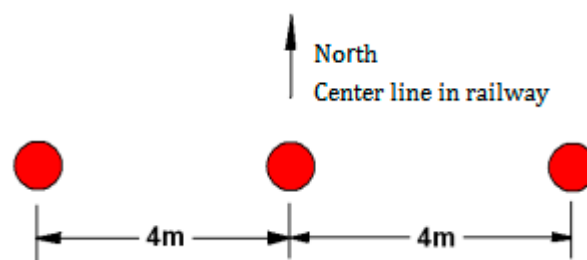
Schematic diagram of the drilling arrangement used for the tests.
